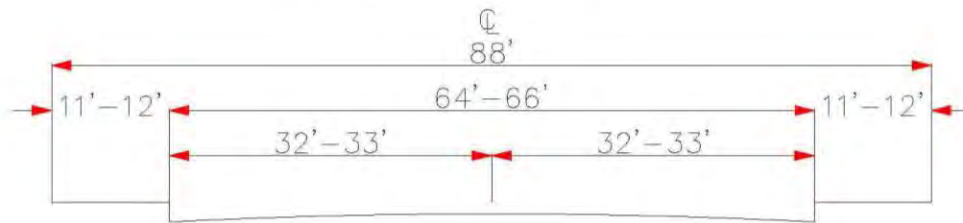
CITY OF SAN BERNARDINO GENERAL PLAN ROADWAY CROSS-SECTIONS
